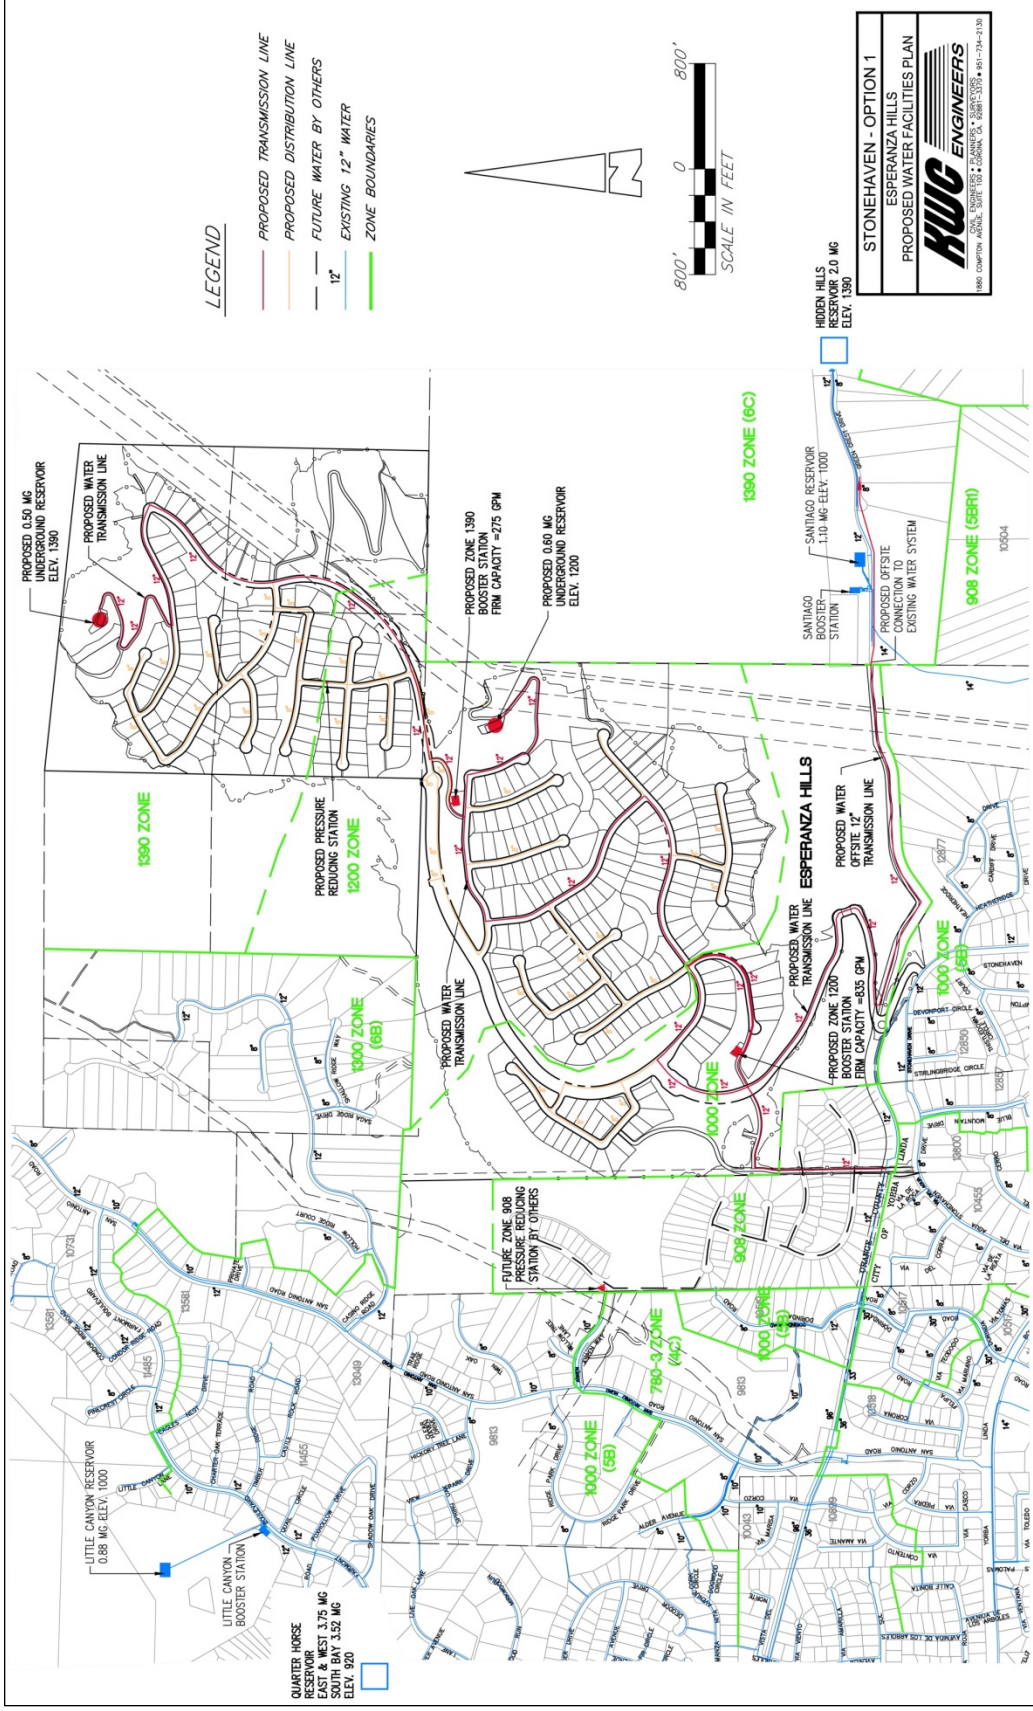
Proposed Water Facilities Plan, Option 1
